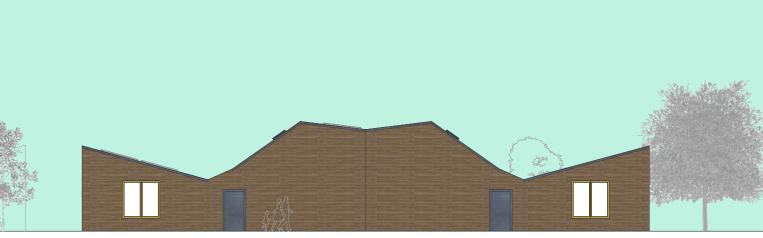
Front / Street facade, View W-N1, 1:200
